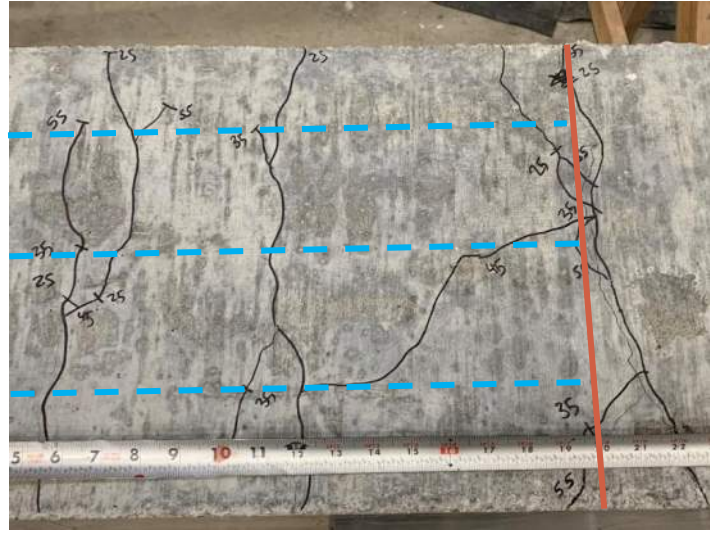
Flexural Cracking at Stirrup Locations
